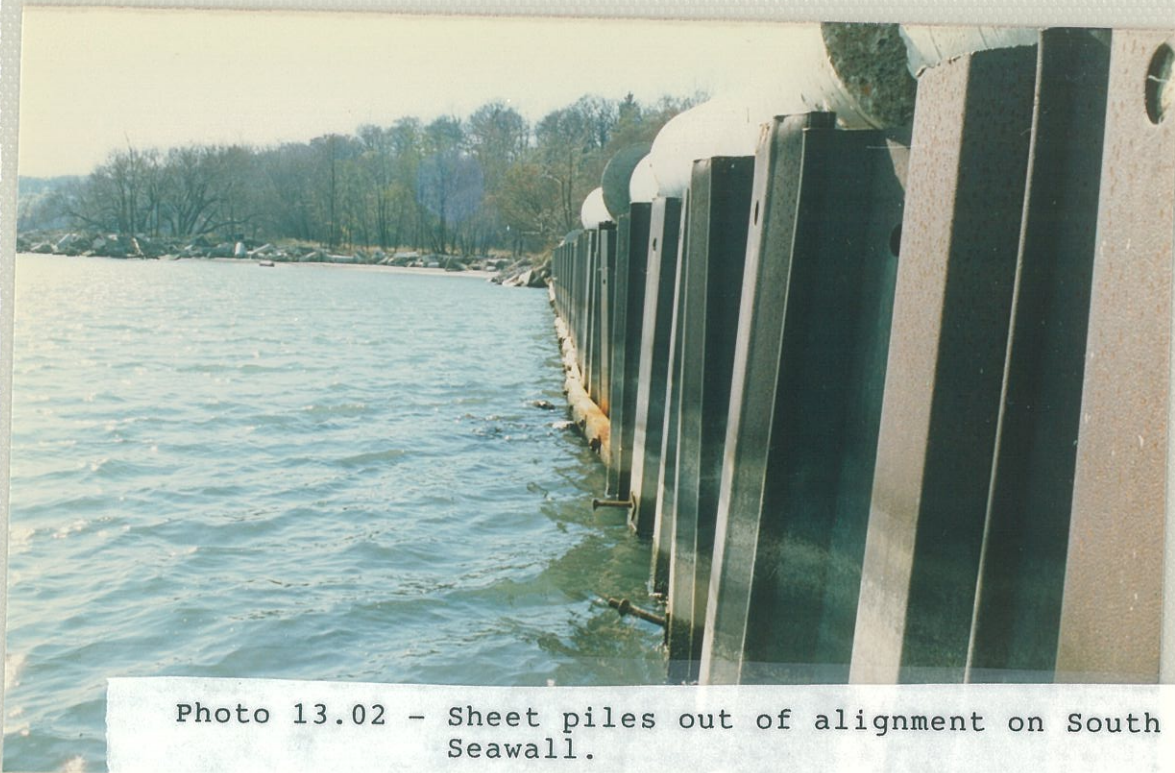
Sheet piles out of alignment on South Seawall.
